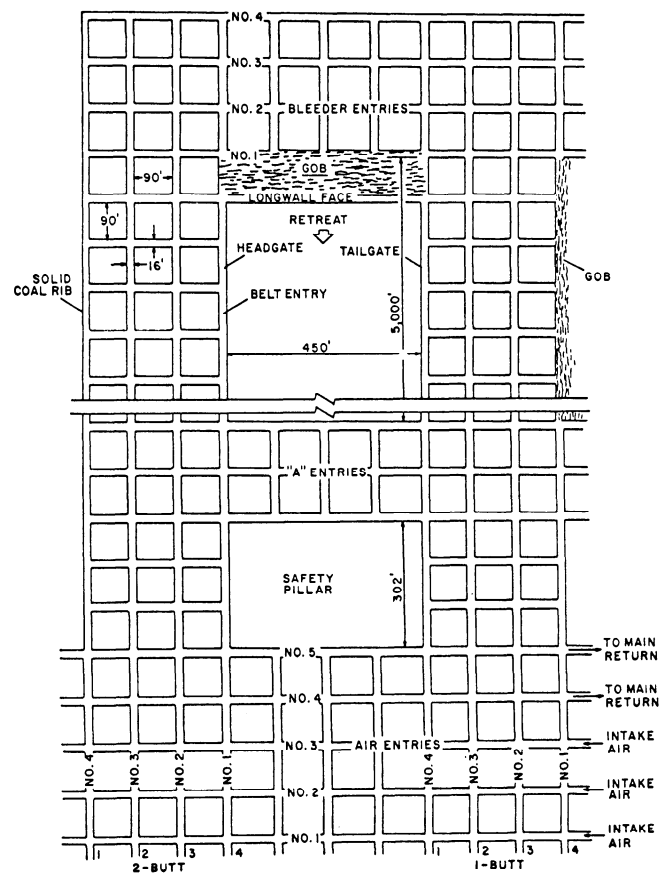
Four-entry longwall ventilation scheme (Anon., 1976).
